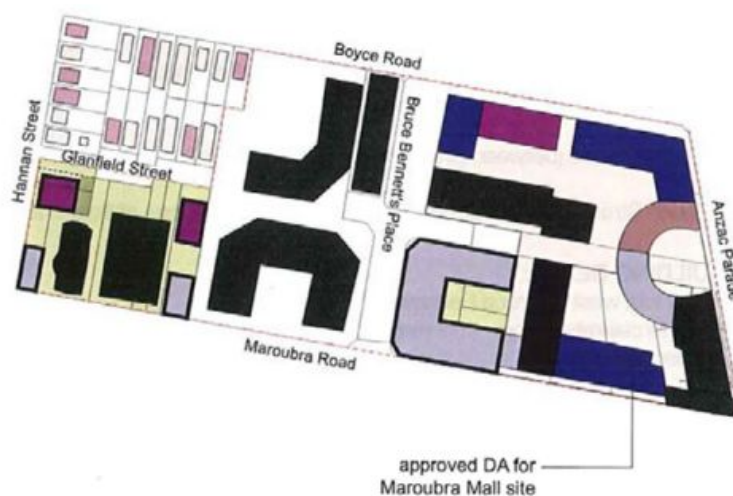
BUILDING ENVELOPE PLAN EXTRACT FROM RANDWICK DCP
